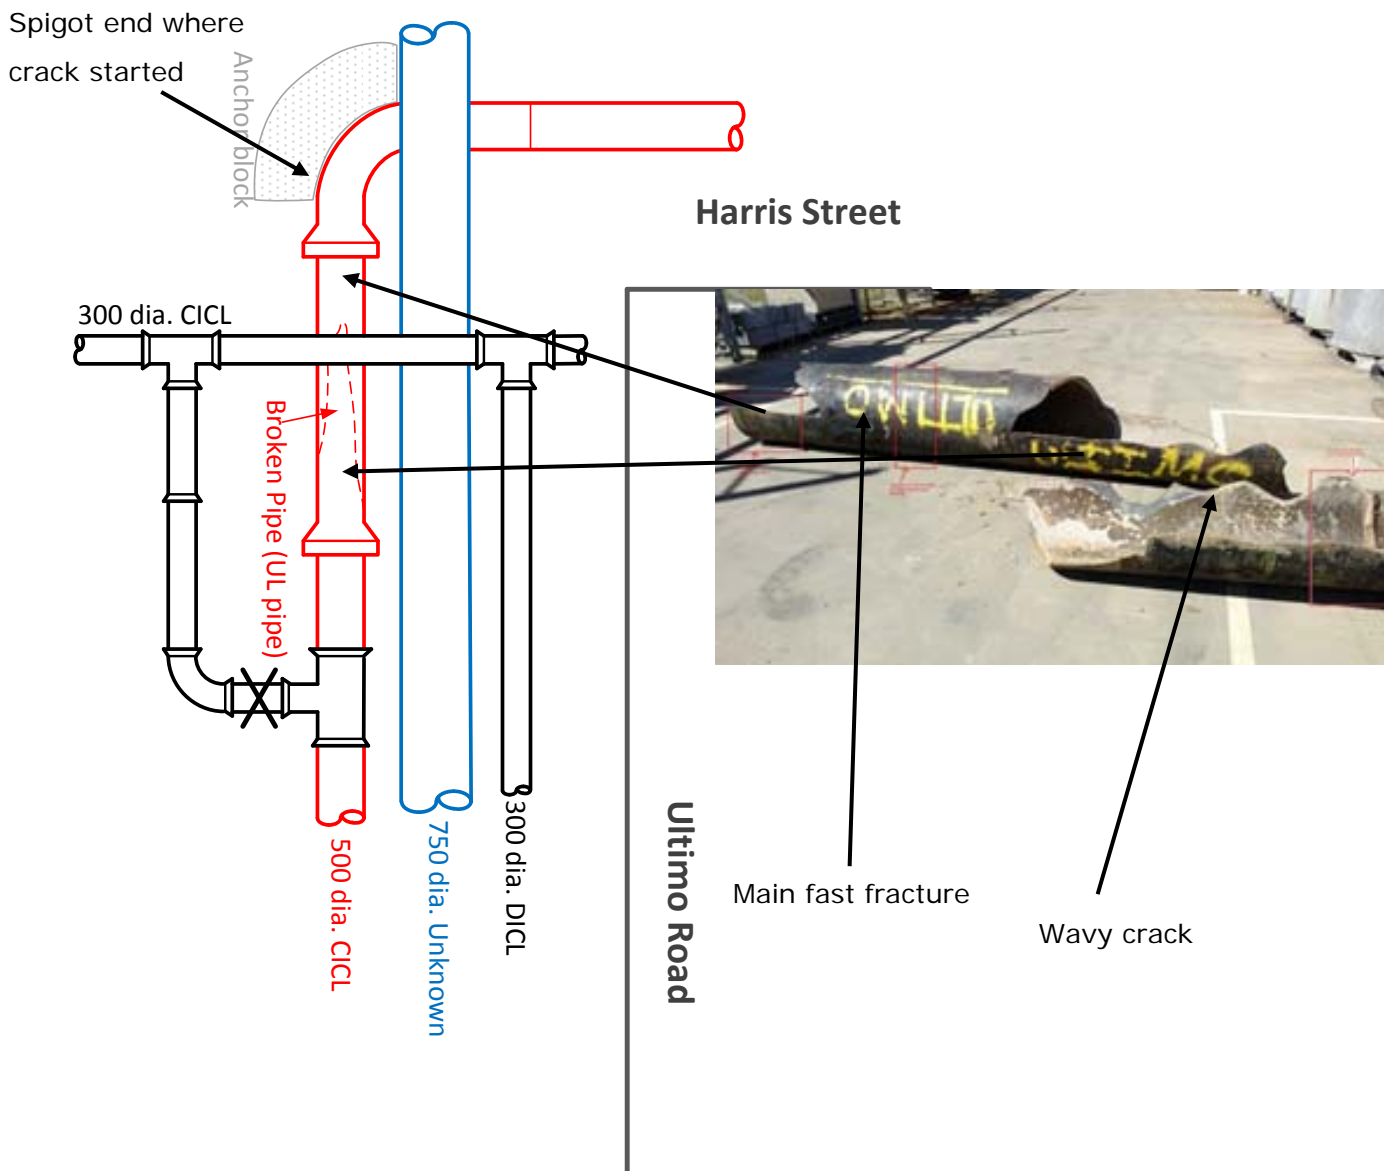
Pipe layout of the failed pipes along with connections and other adjacent pipes (Modified from Ref. [7])
